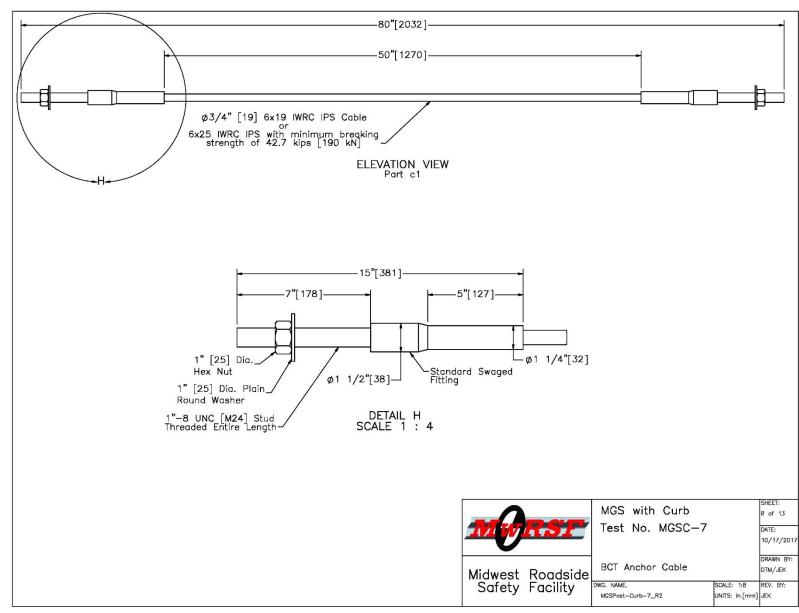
BCT Anchor Cable, Test No. MGSC-7
